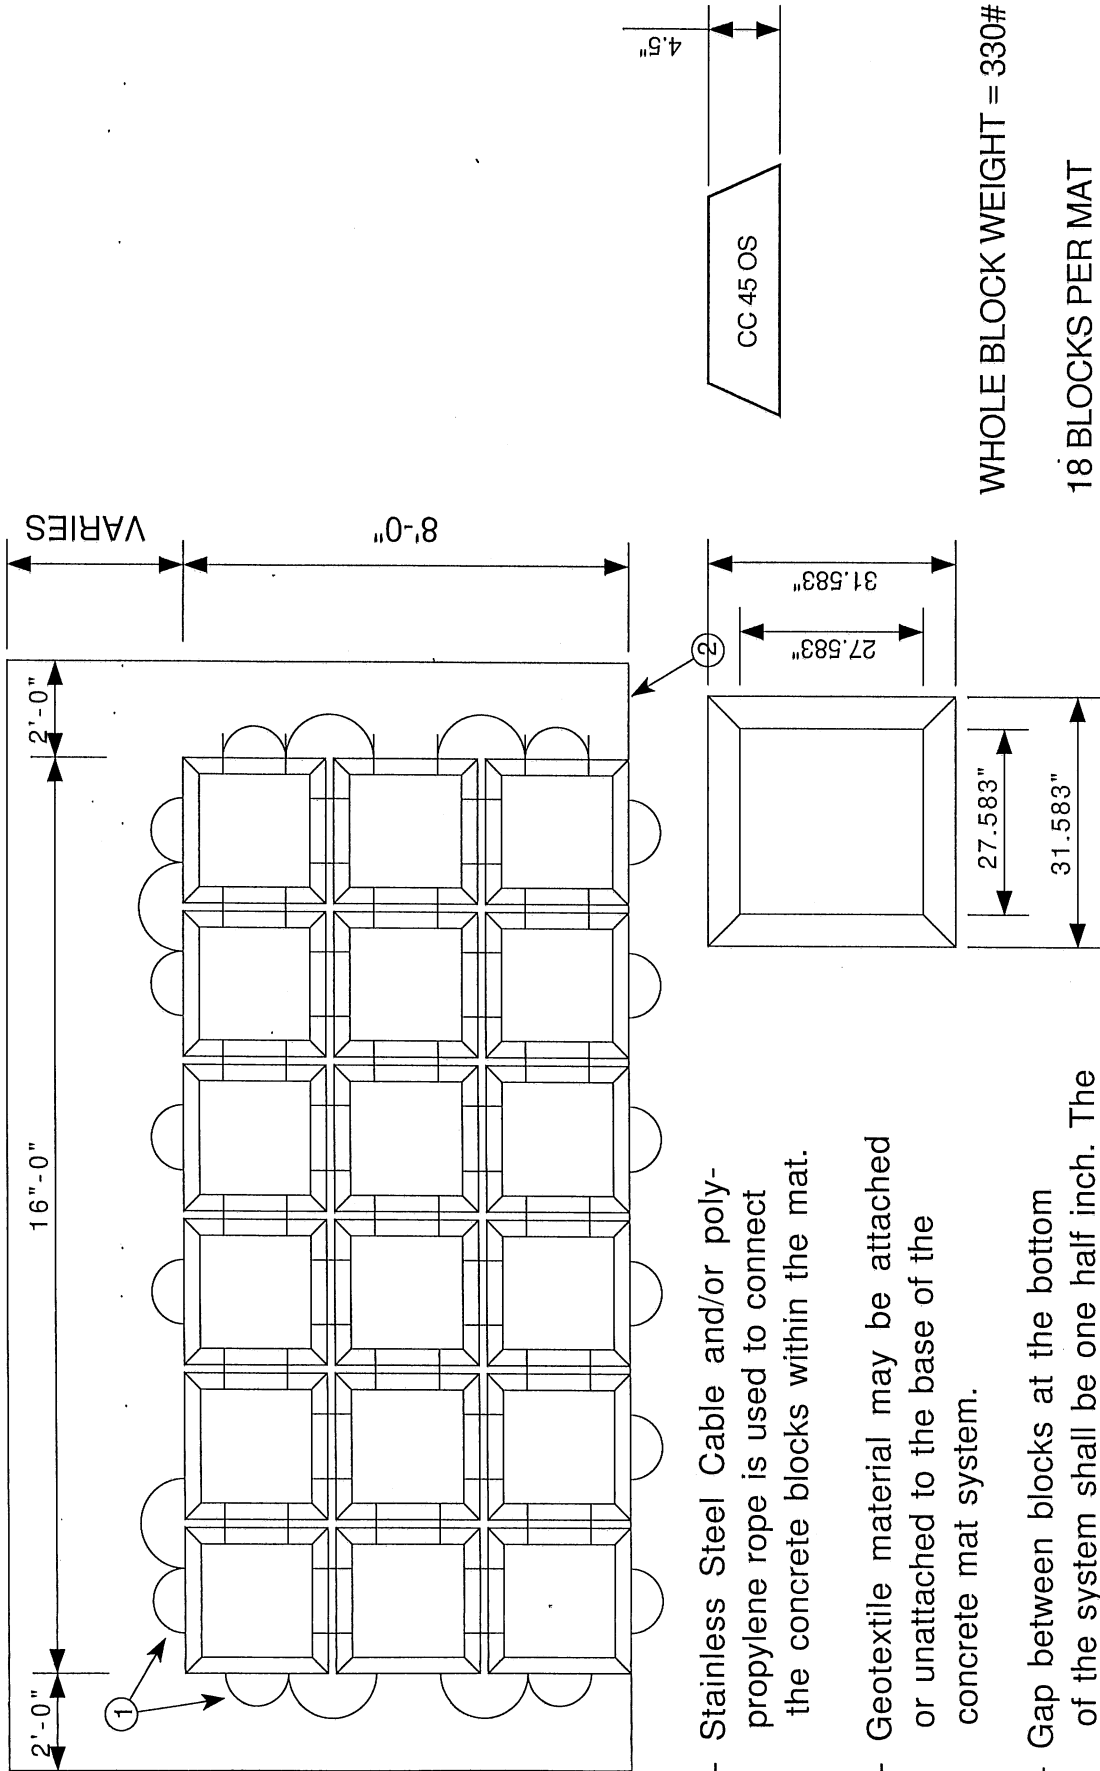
Drawing of CC 45 OS Cable Concrete system and individual blocks.
